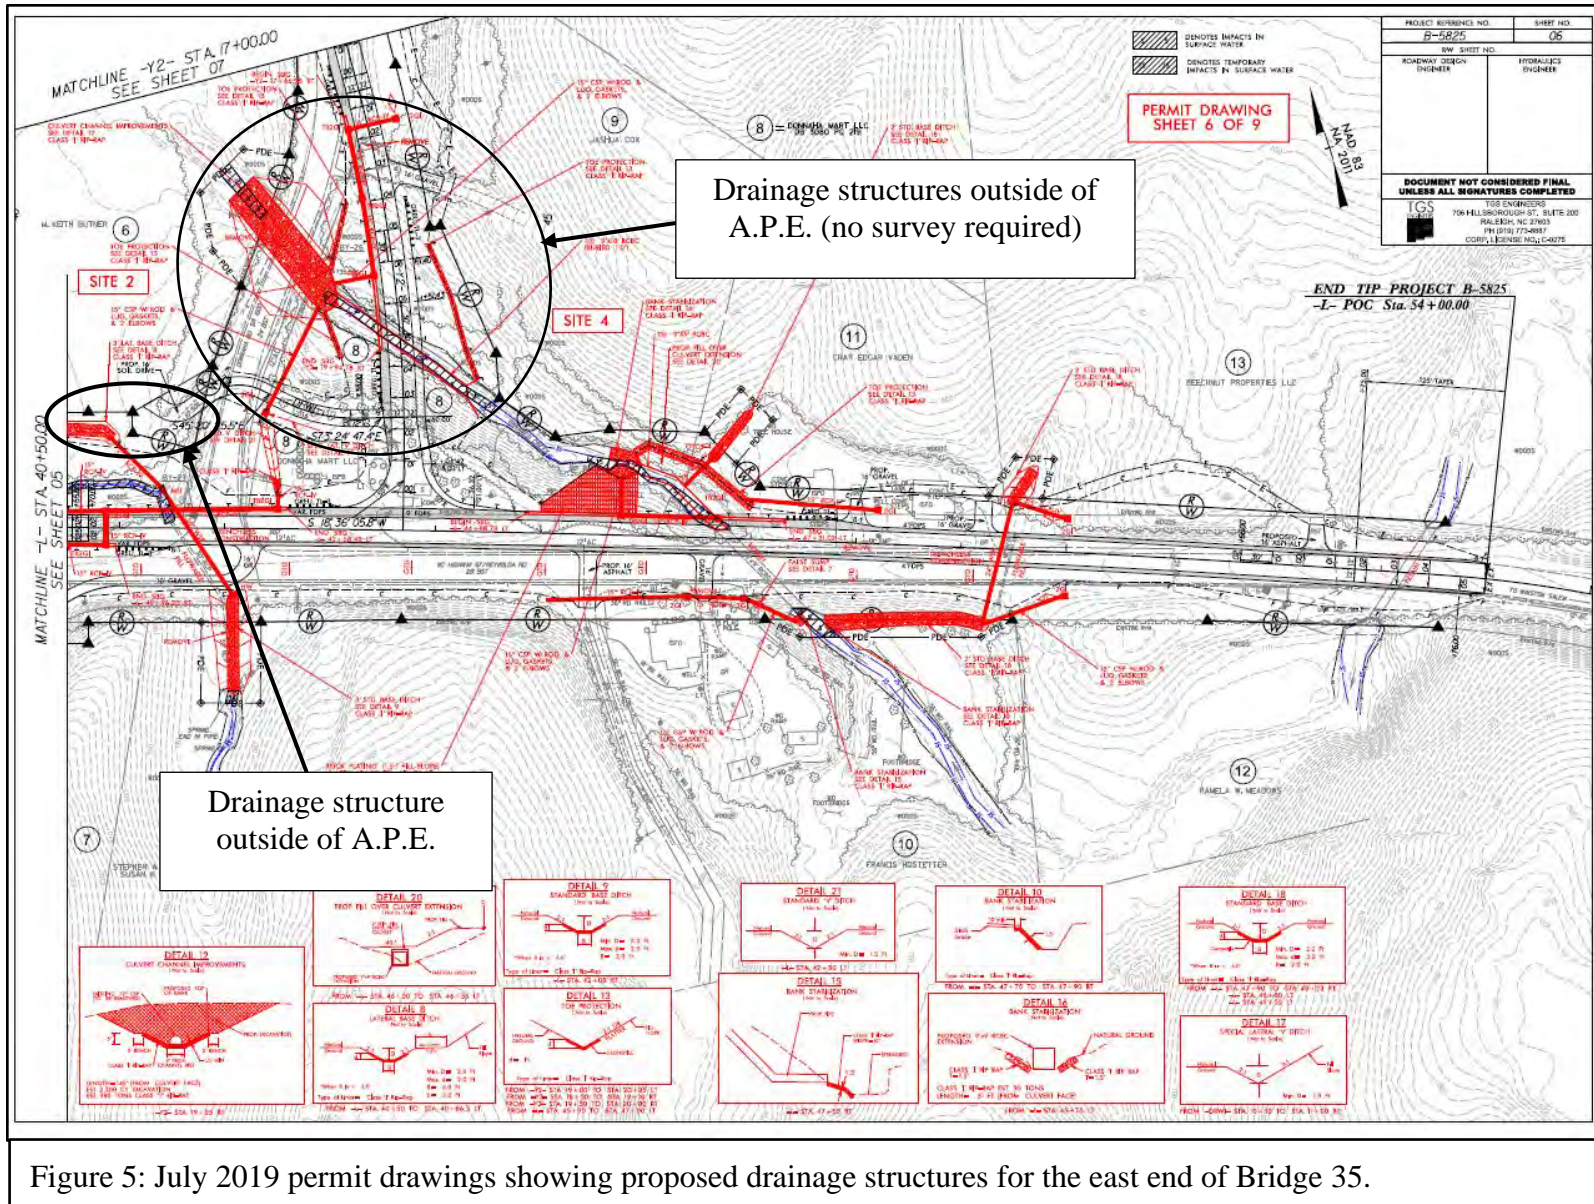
July 2019 permit drawings showing proposed drainage structures for the east end of Bridge 35.
